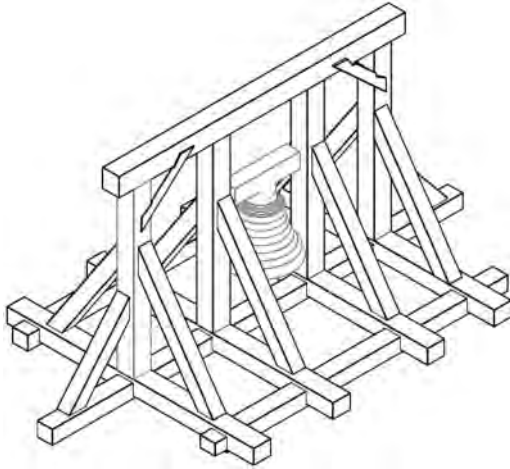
Typical king post construction. Drawing: Iris Engelmann/VG Bild.
